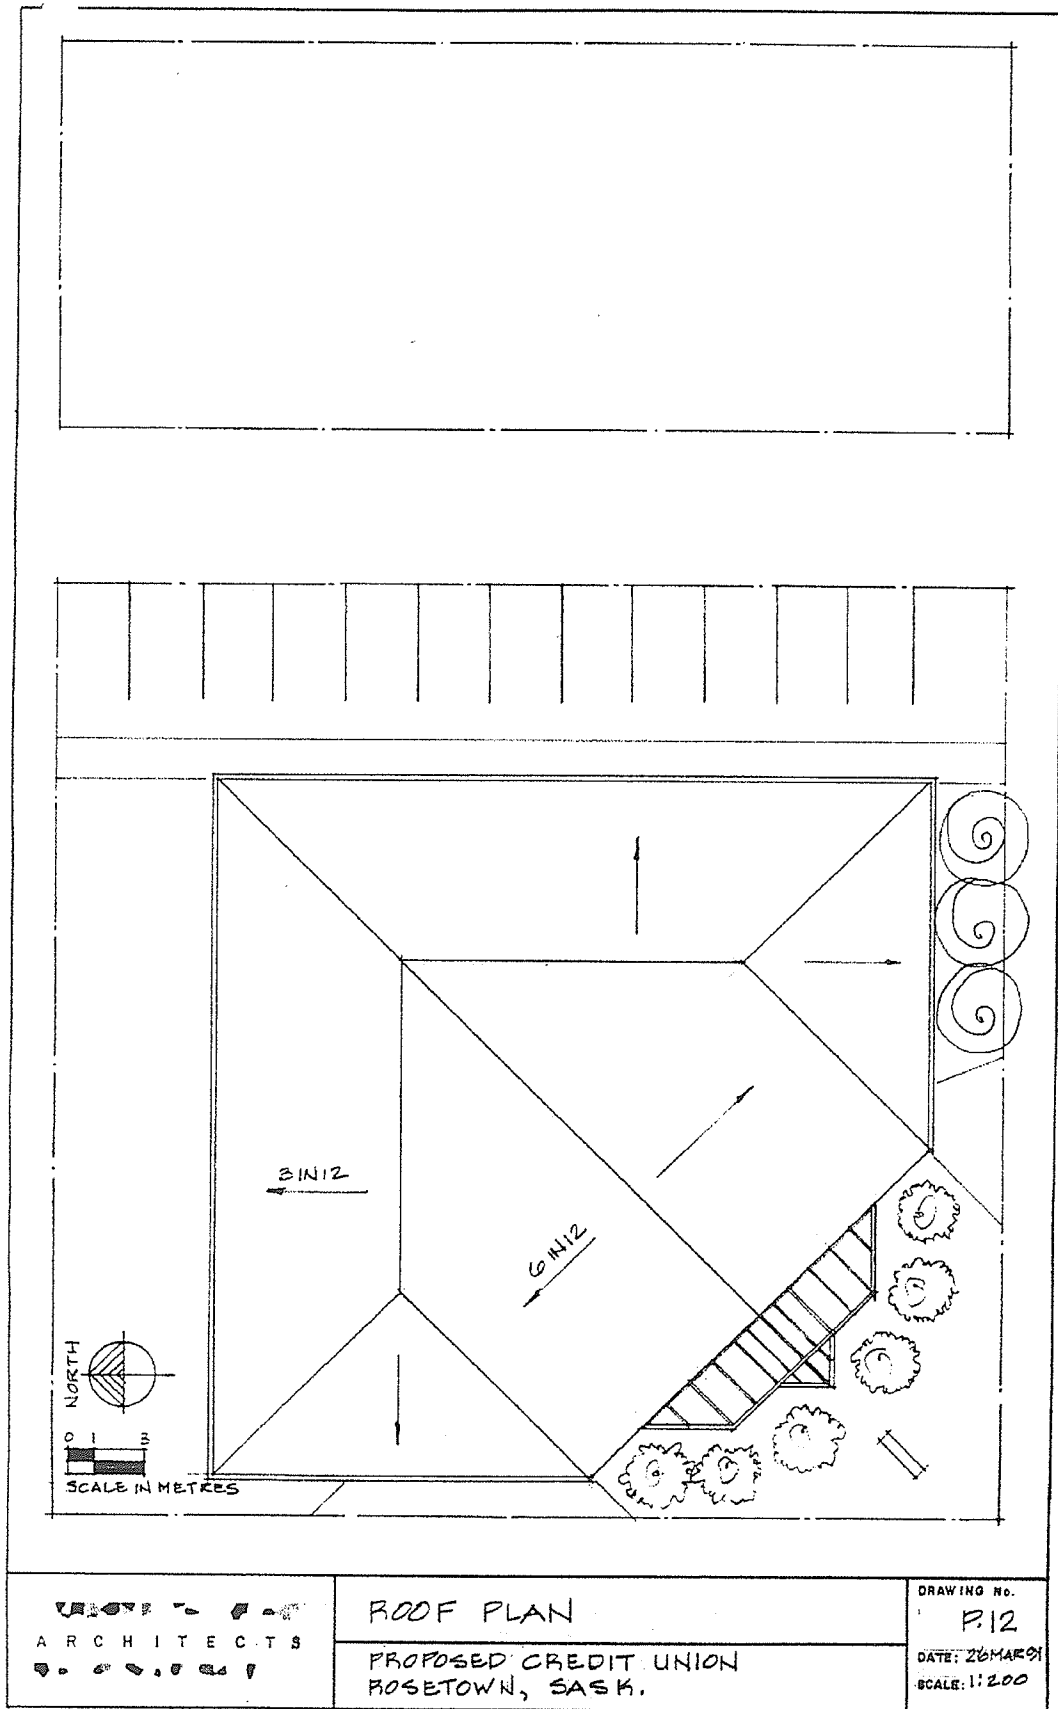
Architect design sketch 12, Roof Plan. Courtesy of the architect.
